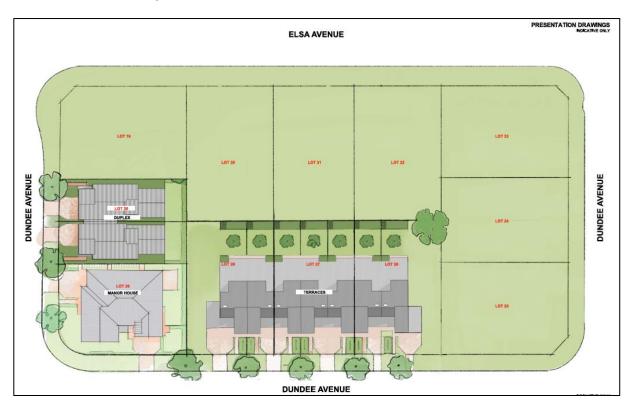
Post Community Consultation Stage 1 Layout Plan and Dwelling Types
